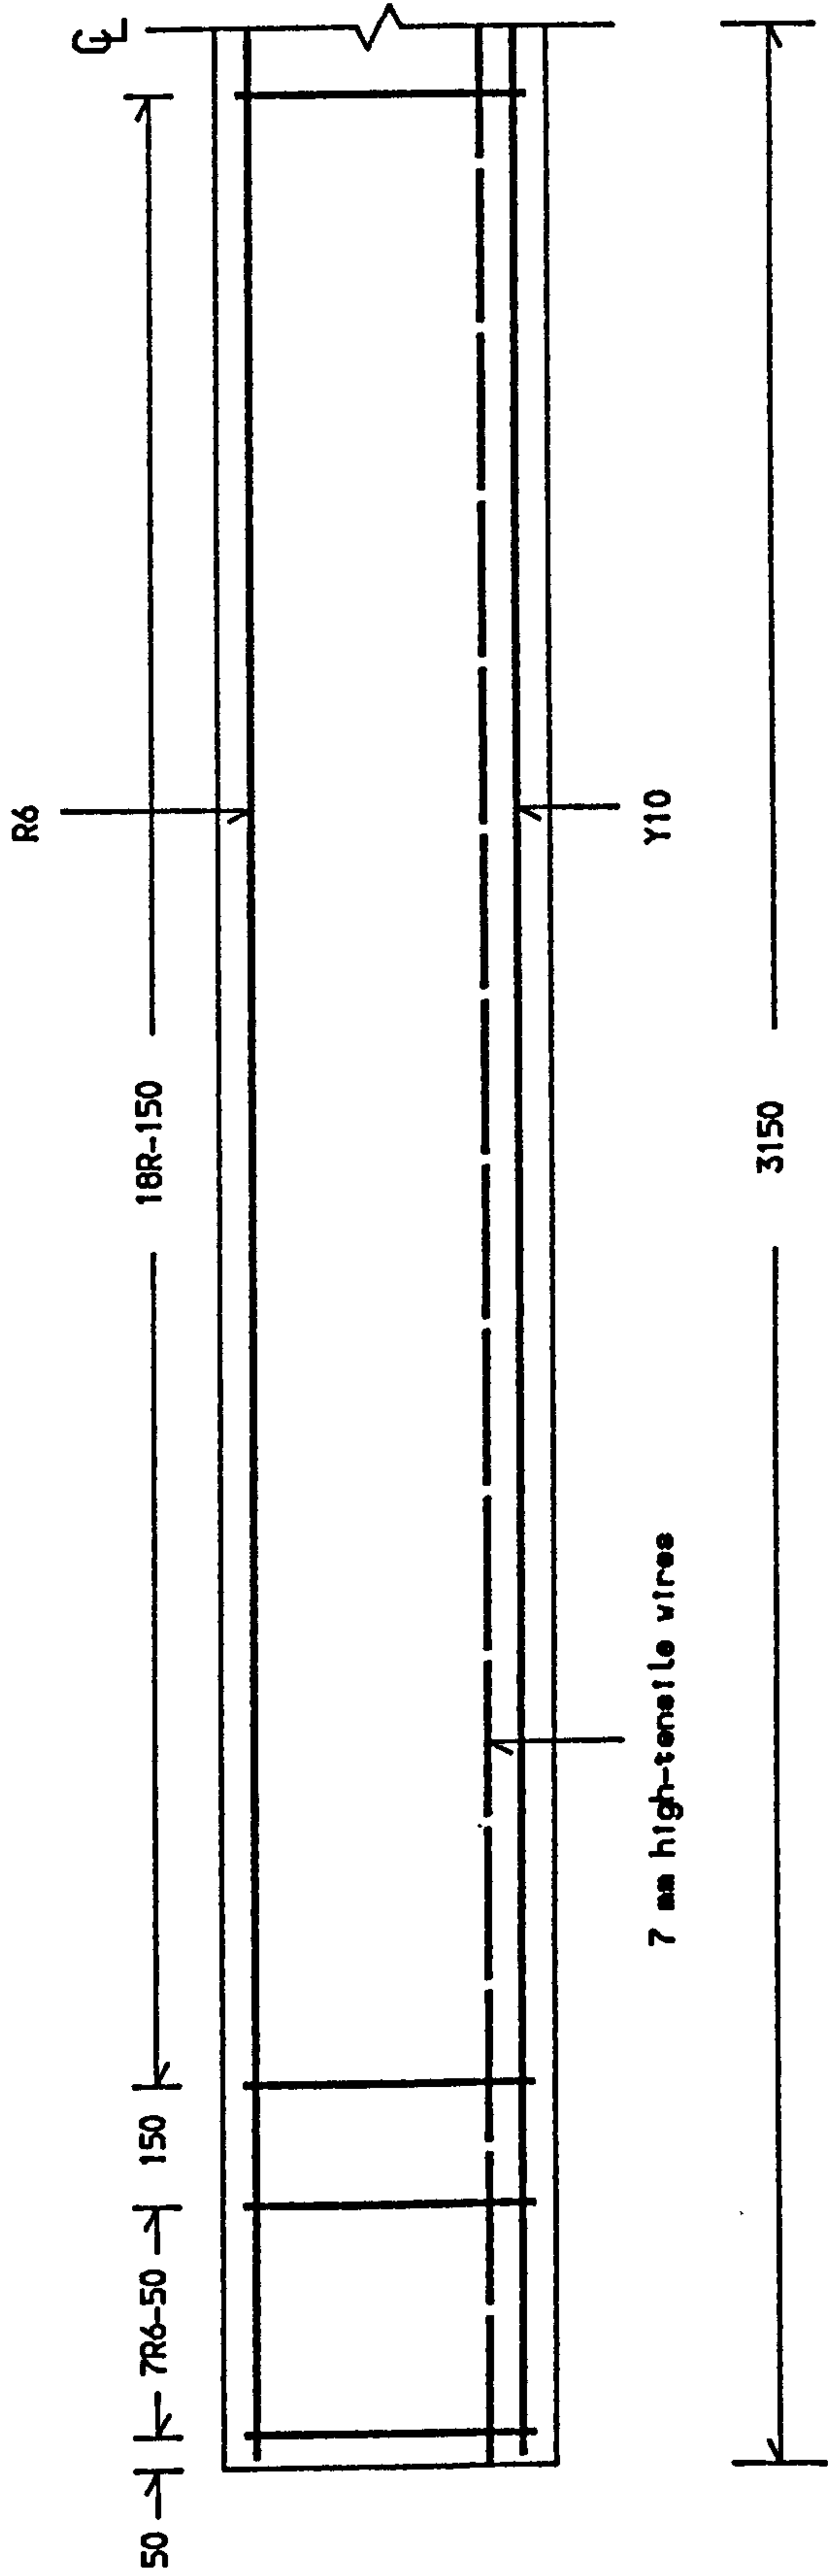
TYPICAL LONGITUDINAL SECTION SHOWING REINFORCEMENT DETAILS
